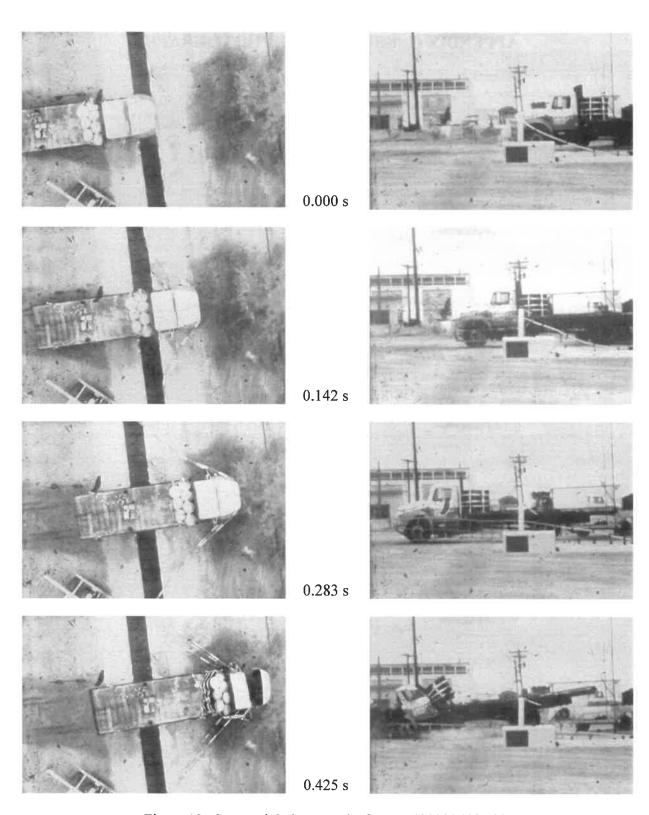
Sequential photographs for test 400001-USR22 (overhead and perpendicular views).
